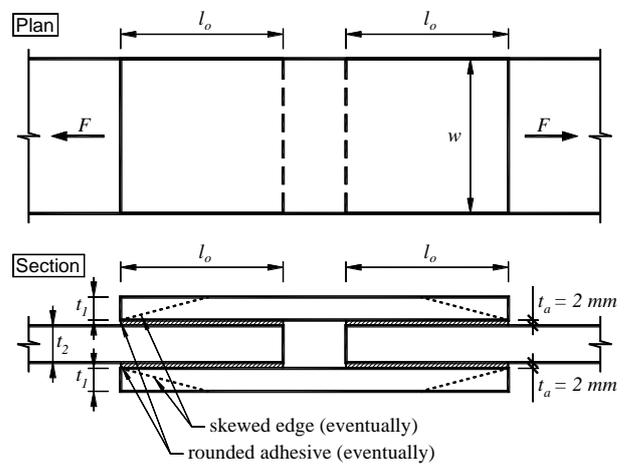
Geometry and parameters of the tested adhesively bonded connection specimens
